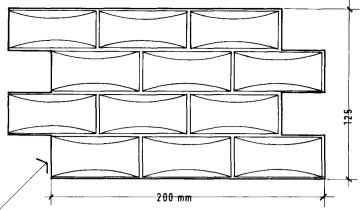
SMALL TERRAZZO CLADDING . EXTERNAL WALL OF THE POST OFFICE BUILDING, MAMPROBI, ACCRA, 1974. ARCHITECT : HANNAH SCHRECKENBACH.
